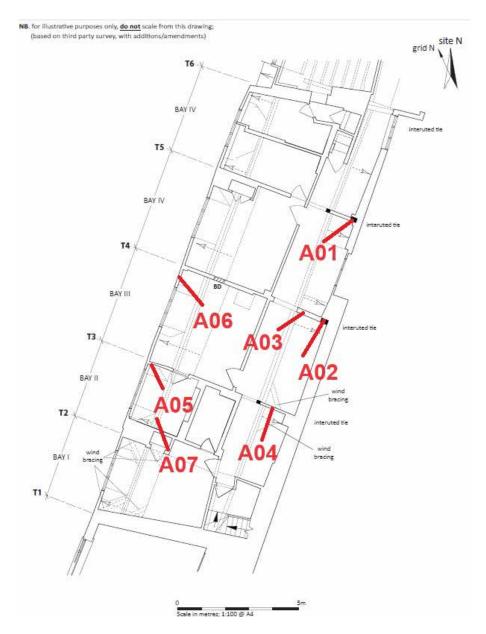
Plan of the Second Floor of Block A, showing the locations of samples taken for dendrochronology. [drawing by Ric Tyler]
